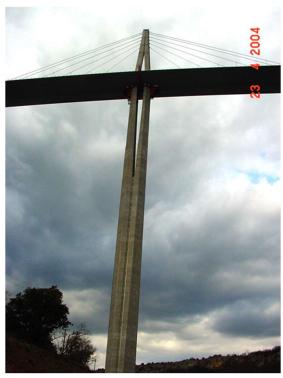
Milau Viaduct - Tallest Bridge of the world approx. 340 m height [57]
